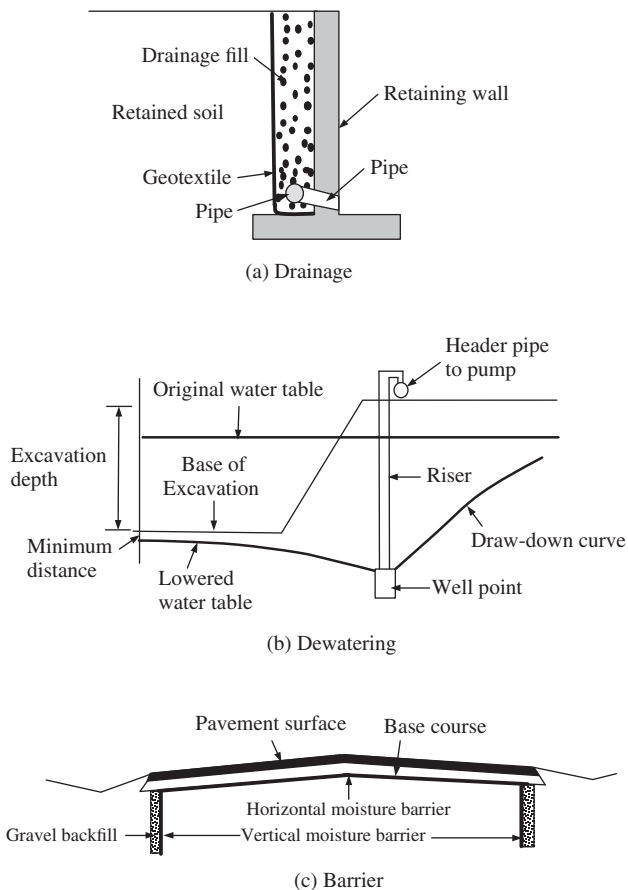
(a) Drainage, (b) dewatering, and (c) barrier.
